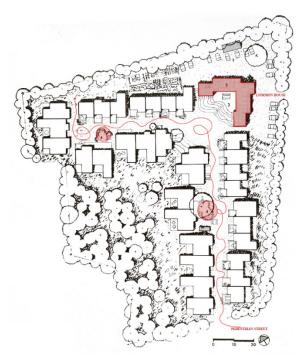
The Trudeslund Co-housing Site Plan (McCamant & Durrett, 1994)
